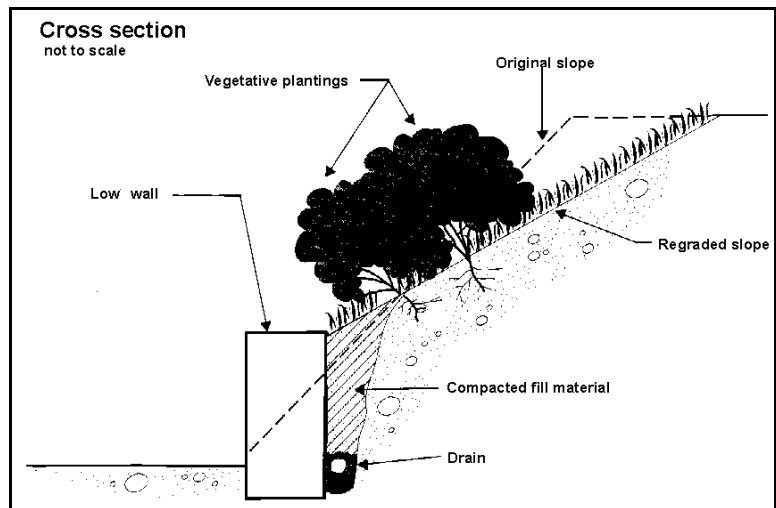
A low wall with plantings above (USDA-SCS, 1992).
